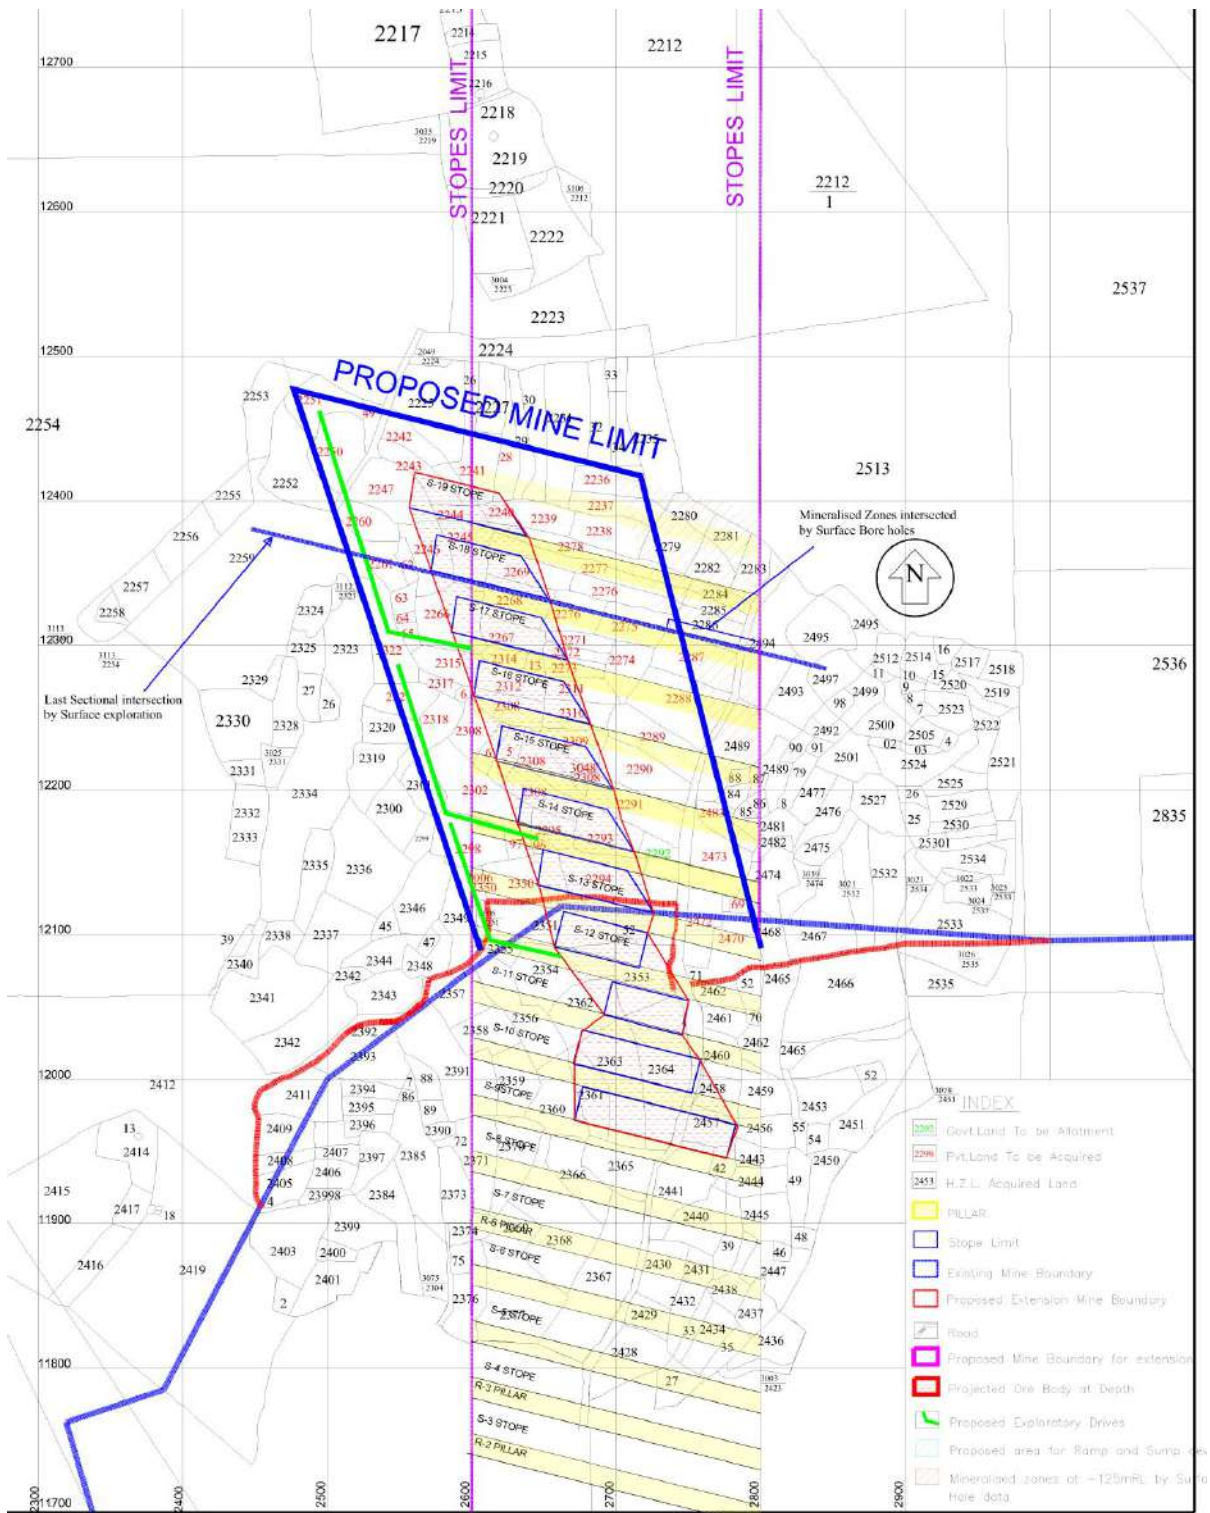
A surface plan showing the mine boundary, ore limit and the proposed stopes
